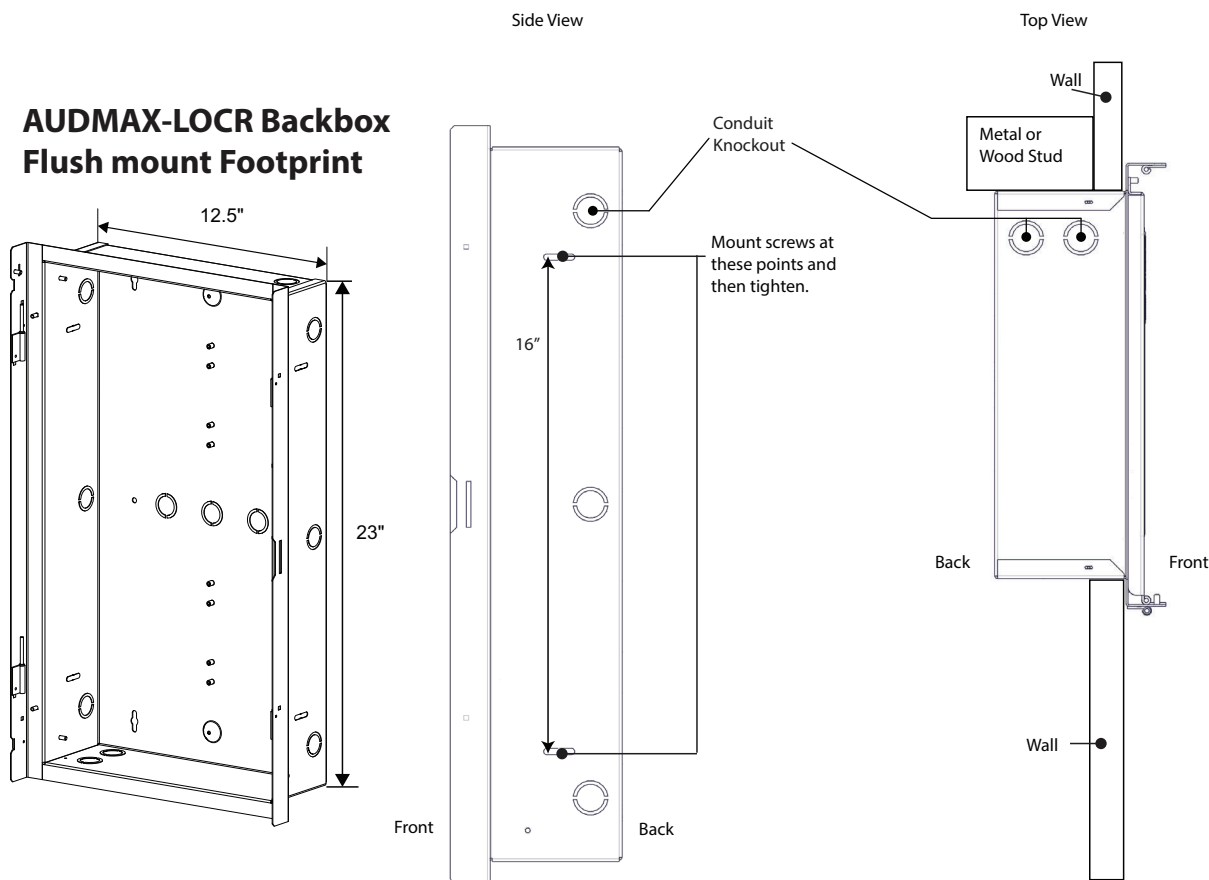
AUDMAX-LOCR Knockout and board anchors detail
